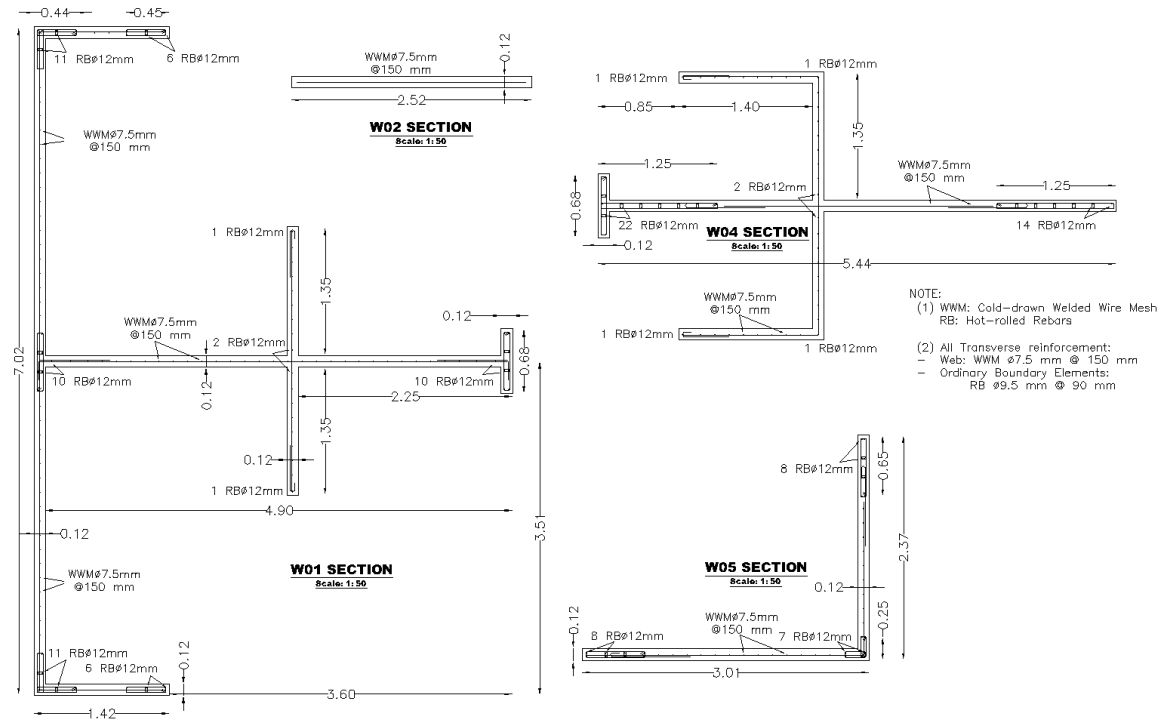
Typical reinforcement layout of key wall specimens in the 10-story building. Units: meters
